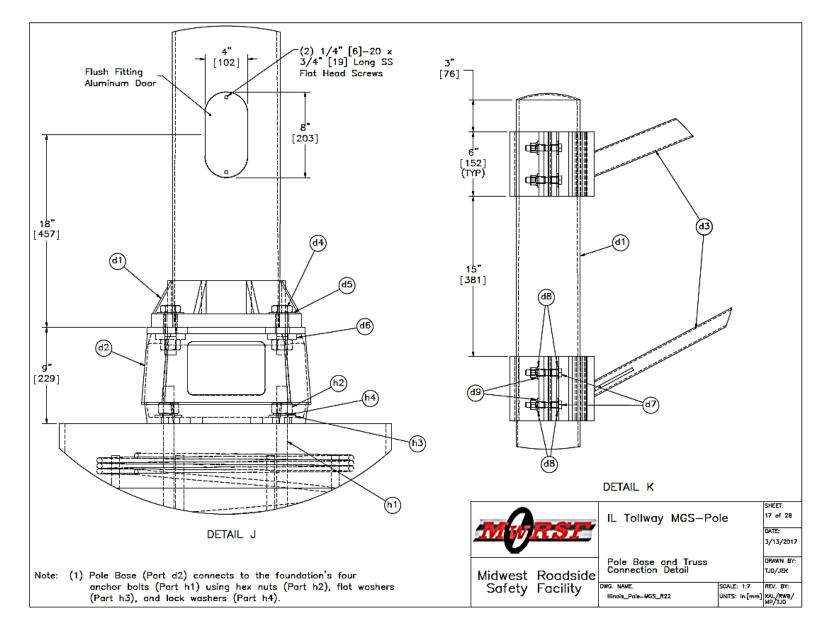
Pole Base and Truss Connection Detail, Test No. ILT-1
